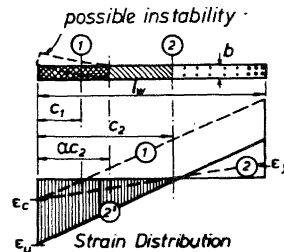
STRAIN PATTERNS IN RECTANGULAR WALL SECTIONS
